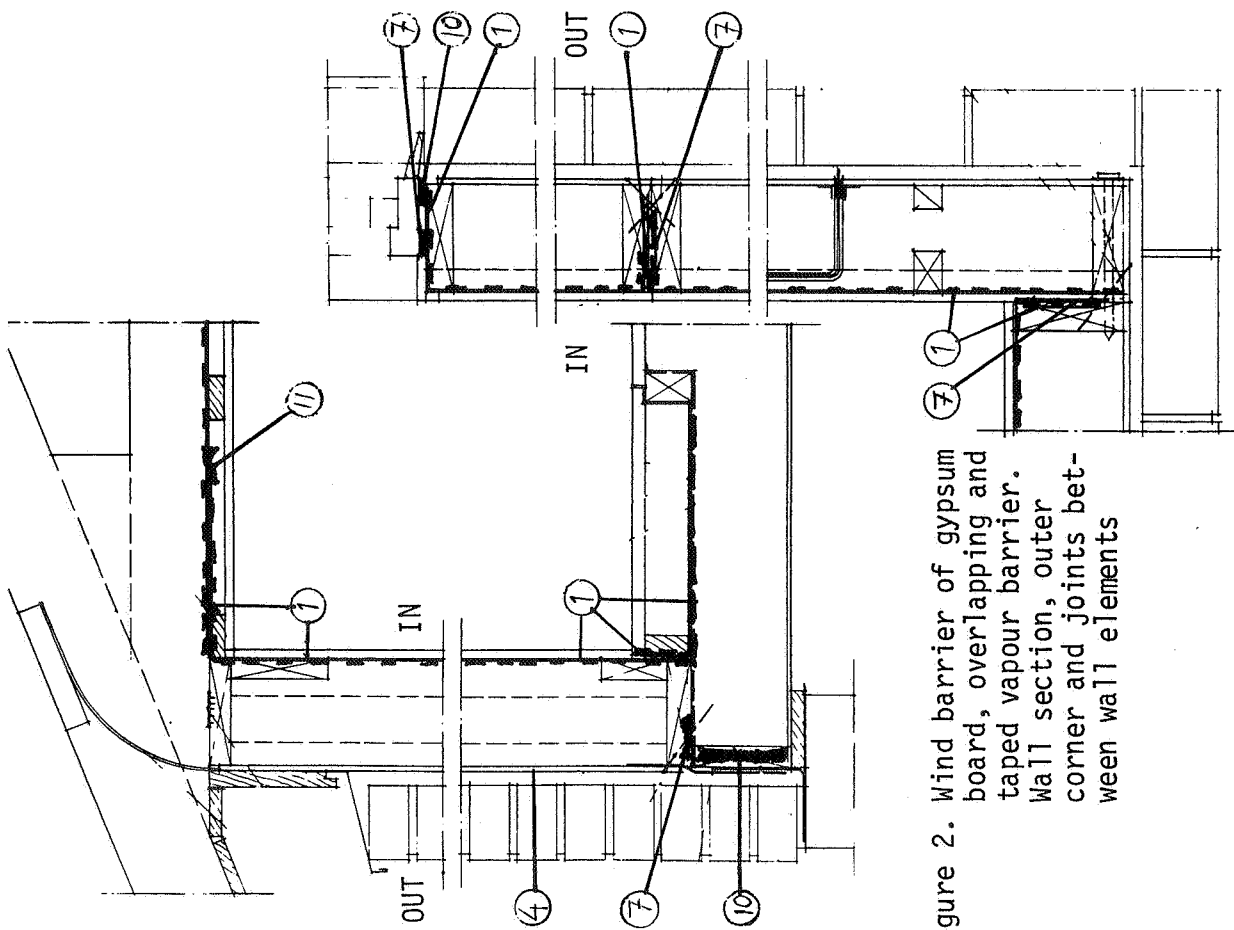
Wind barrier of gypsum board, overlapping and taped vapour barrier. Wall section, outer corner and joints between wall elements
